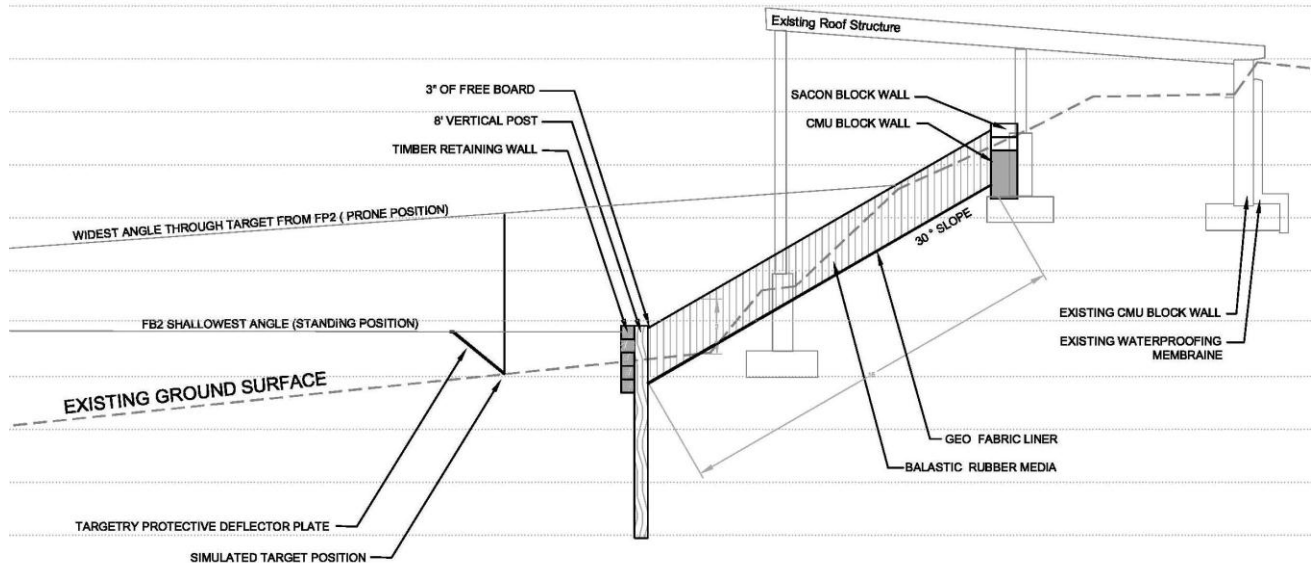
Cross section of a granular rubber bullet trap system (source: AMEC Renovation Plan for Range 2 [Ulupau RTF], May 2007). The proposed square-bay ranges would have a similar design but would not have a roof
